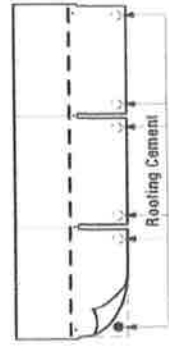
Use four nails and six spots of asphalt cement on steep slopes. *CAUTION: Excessive use of roofing cement can cause shingles to blister.
